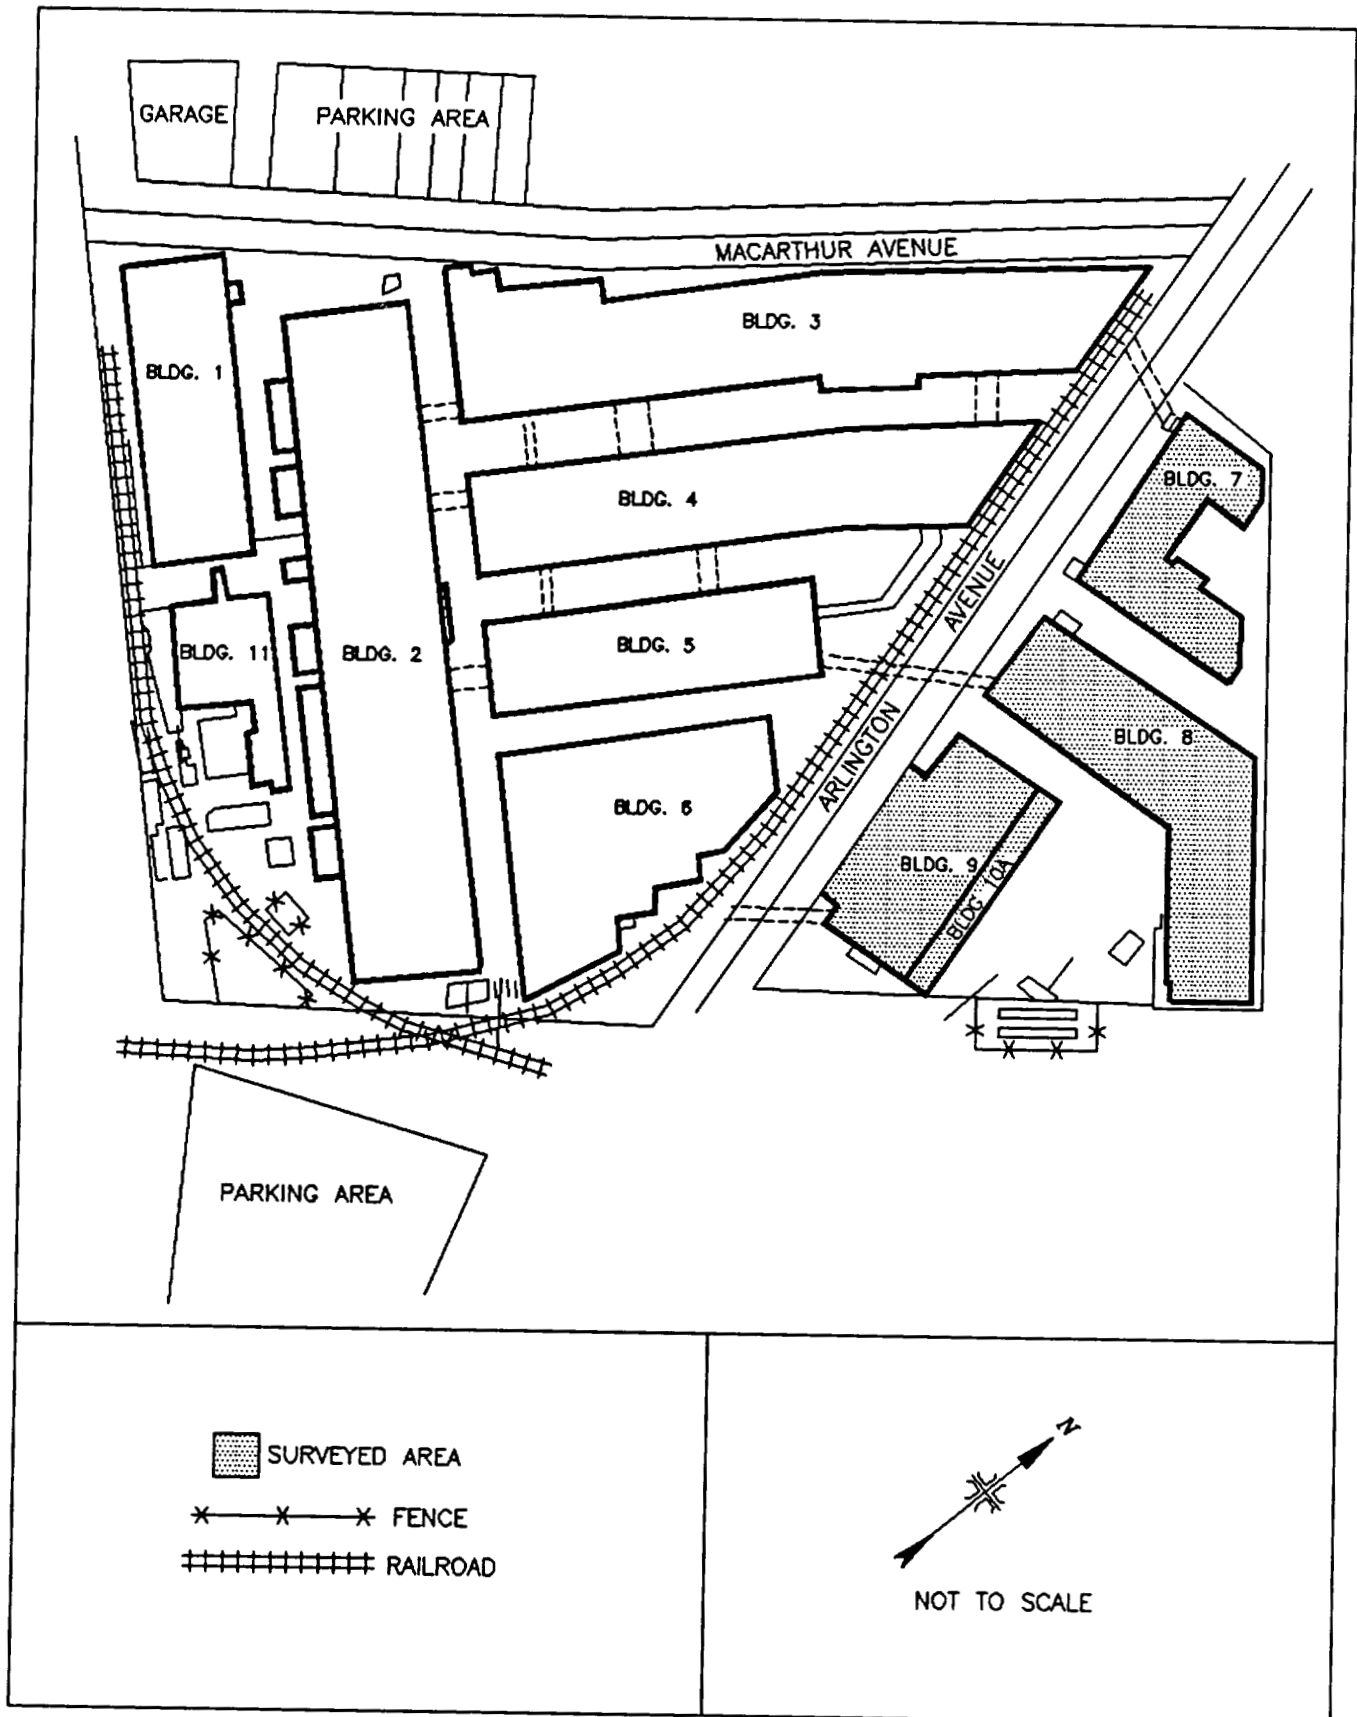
Plot Plan of the Westinghouse Electric Corporation's Bloomfield Lamp Plant
